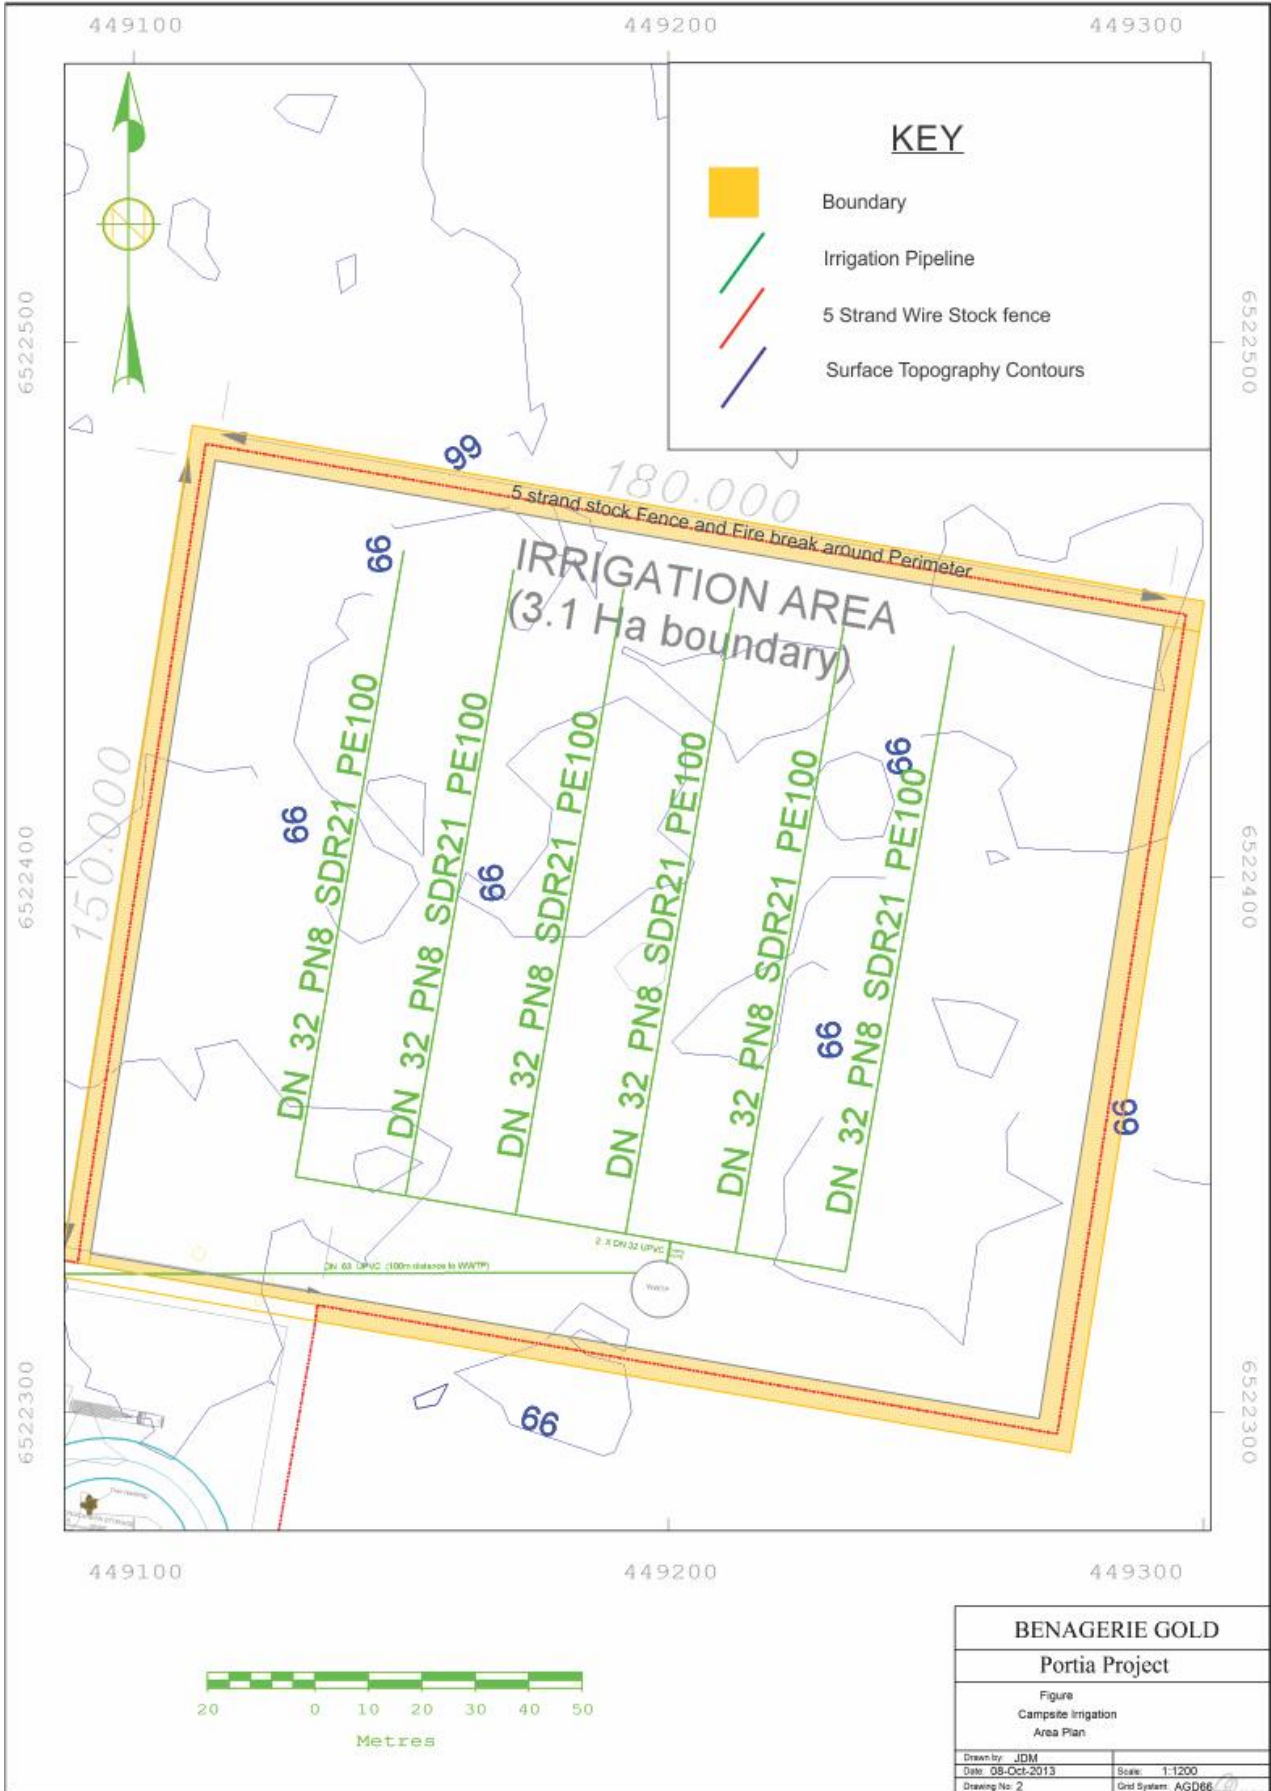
General Layout Plan of the Campsite Evaporation Irrigation Area (Design)
